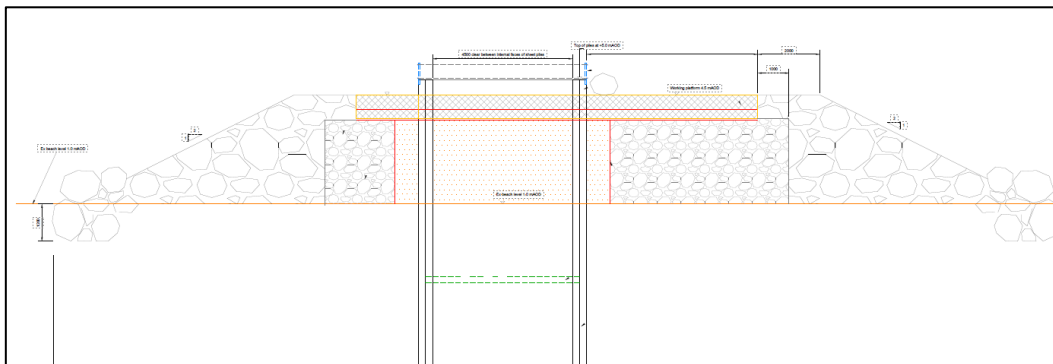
Typical Cross Section of Proposed AP10 Cofferdam Layout
